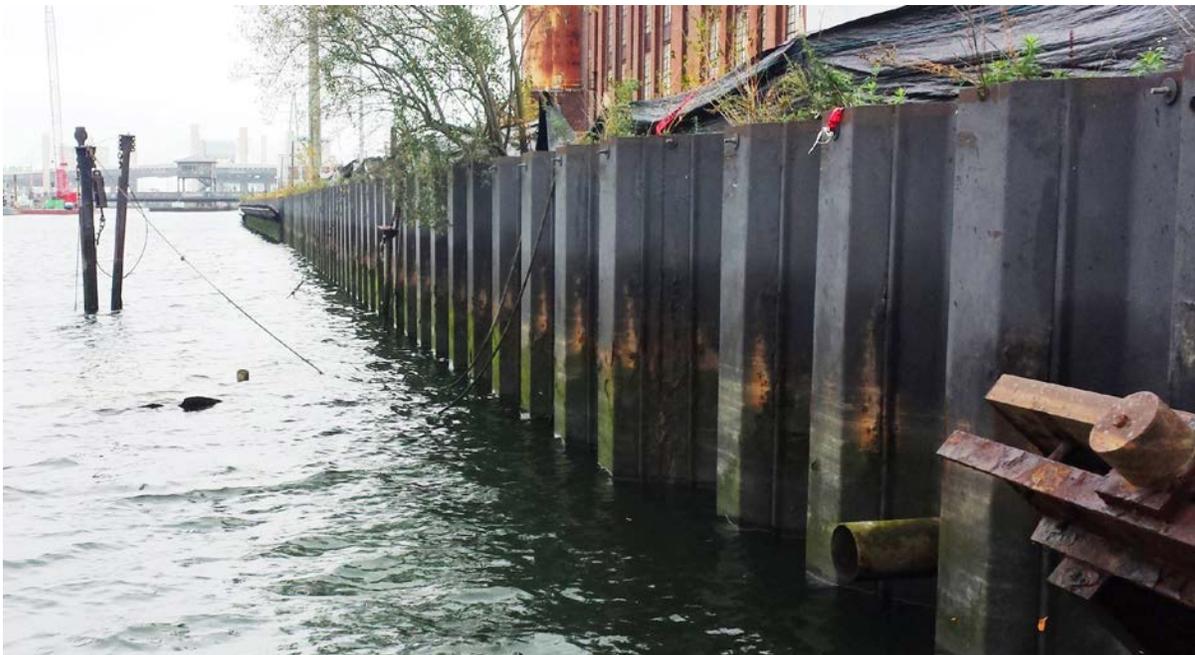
Phase 2 East looking south, note coating deterioration on wale
